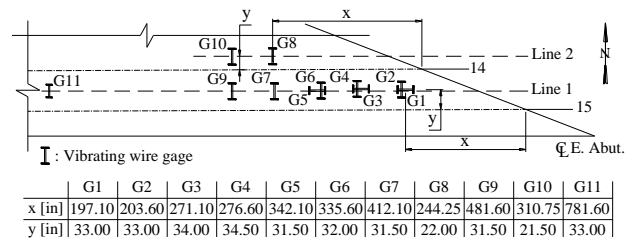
Deck vibrating wire strain gages layout shown on plan view [1 in = 0.0254 m]
